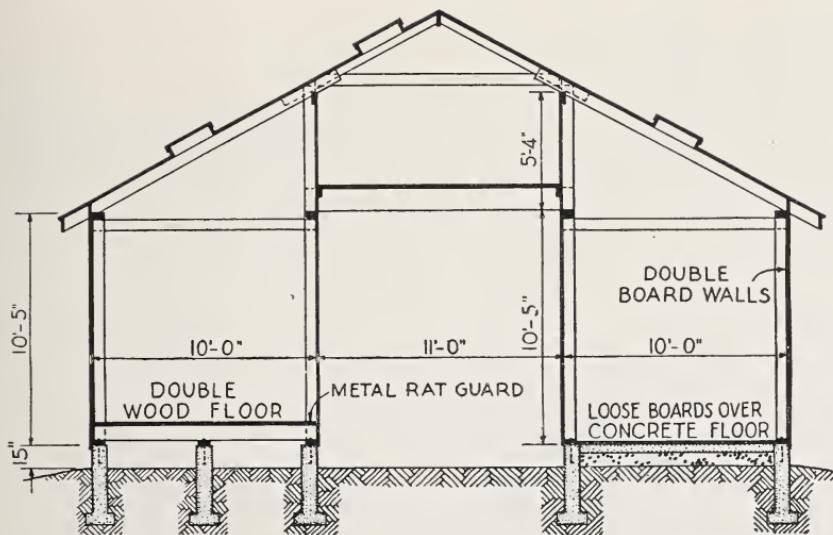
Cross section of granary design, showing wide footings, in connection with both wood and concrete floors. Note anchor bolts, studs lapping and spiked to wood joists, and double-boarded wall with no inside lining.
